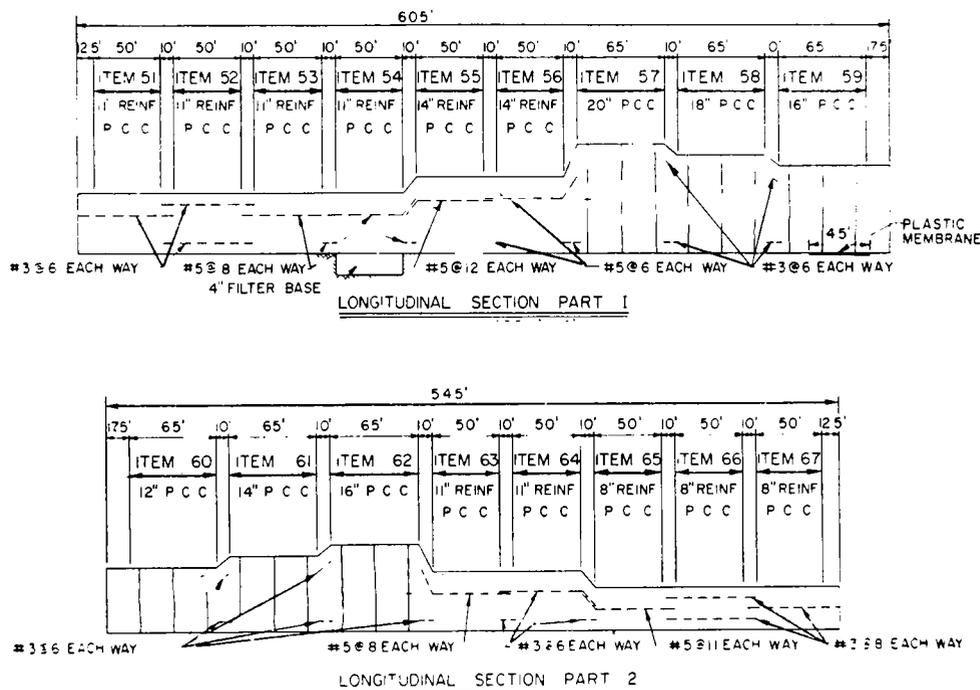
Design layout for channelized traffic test track, Sharonville, Ohio, 1955-6.
